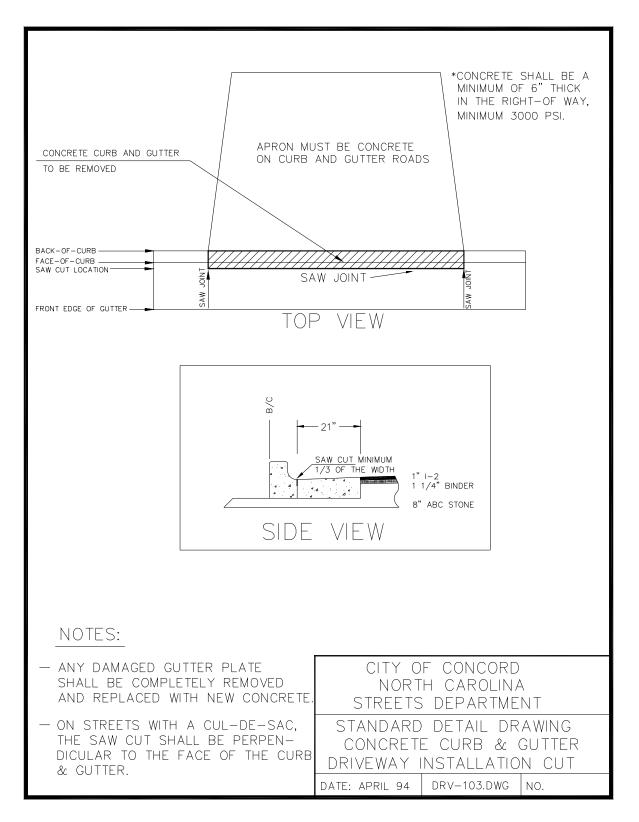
Concrete Curb and Gutter Driveway Cut.
